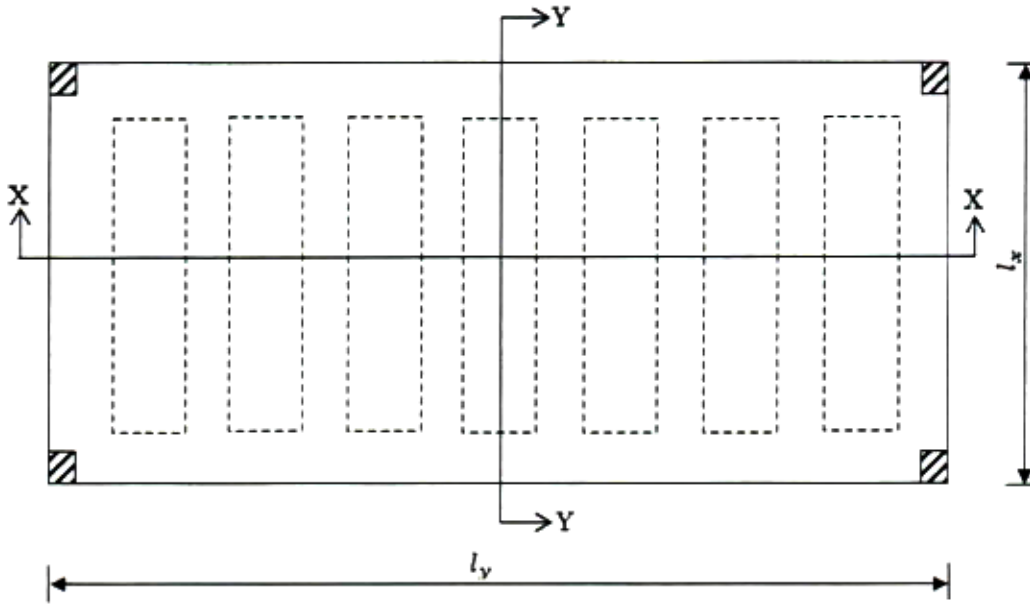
Plan of Burnt Clay Hollow Block Slab showing the layout of the Hollow Blocks
